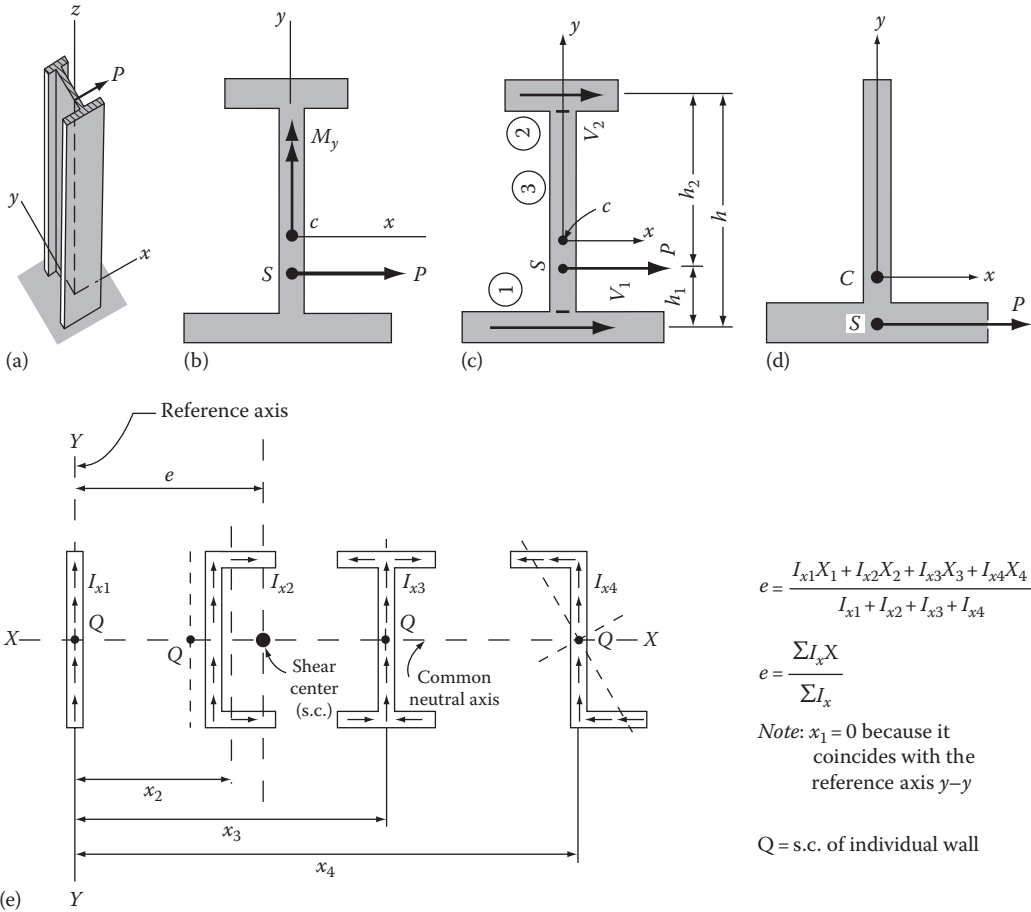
(a) Singly symmetrical shear wall. (b) Shear center S as it relates to centroid C . (c) Shear forces in flanges. (d) Shear center in a T-section shear wall. (e) Shear center concept; shear walls bending about a common neutral axis.
